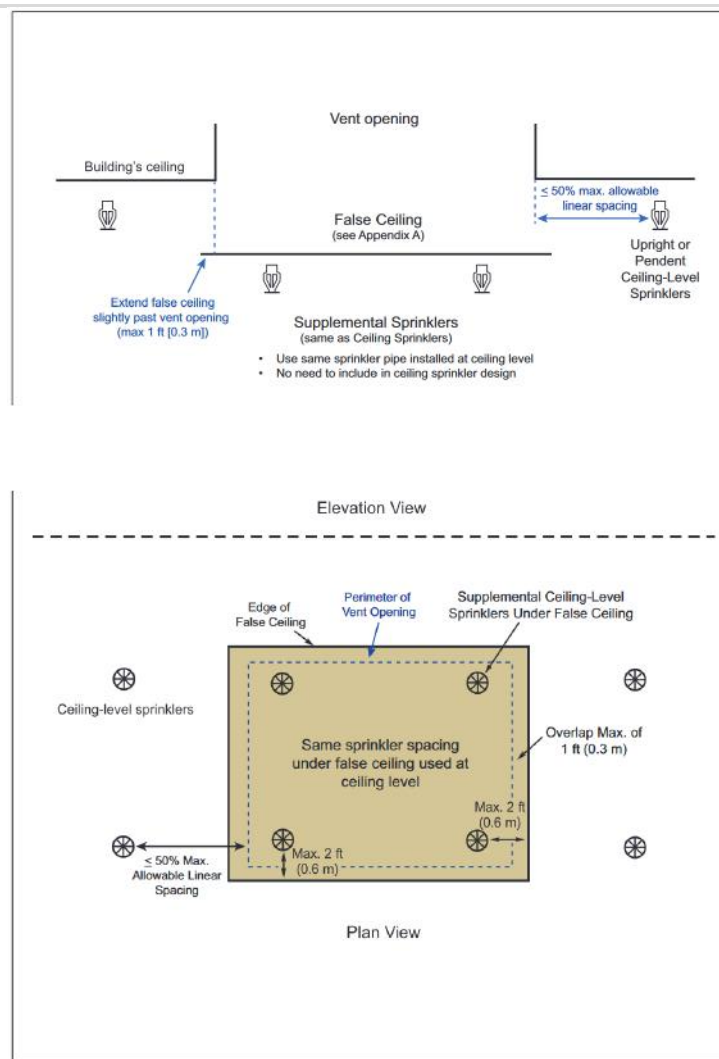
(b). Protection of vent openings at ceiling level, such as heat vents, smoke vents, powered or natural draft exhaust vents, with a tight, continuous false ceiling and supplemental ceiling-level sprinklers
